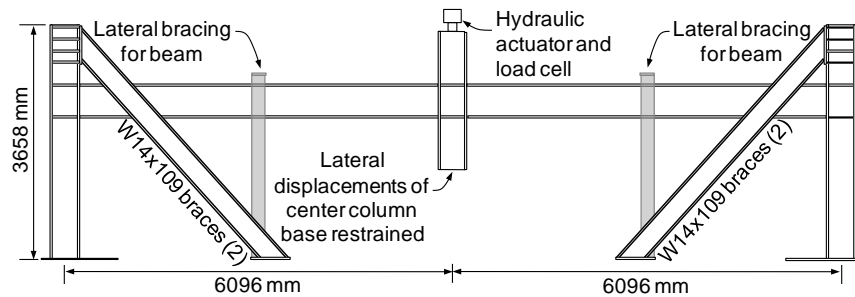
Test configuration for steel beam-column assembly with WUF-B connections.
